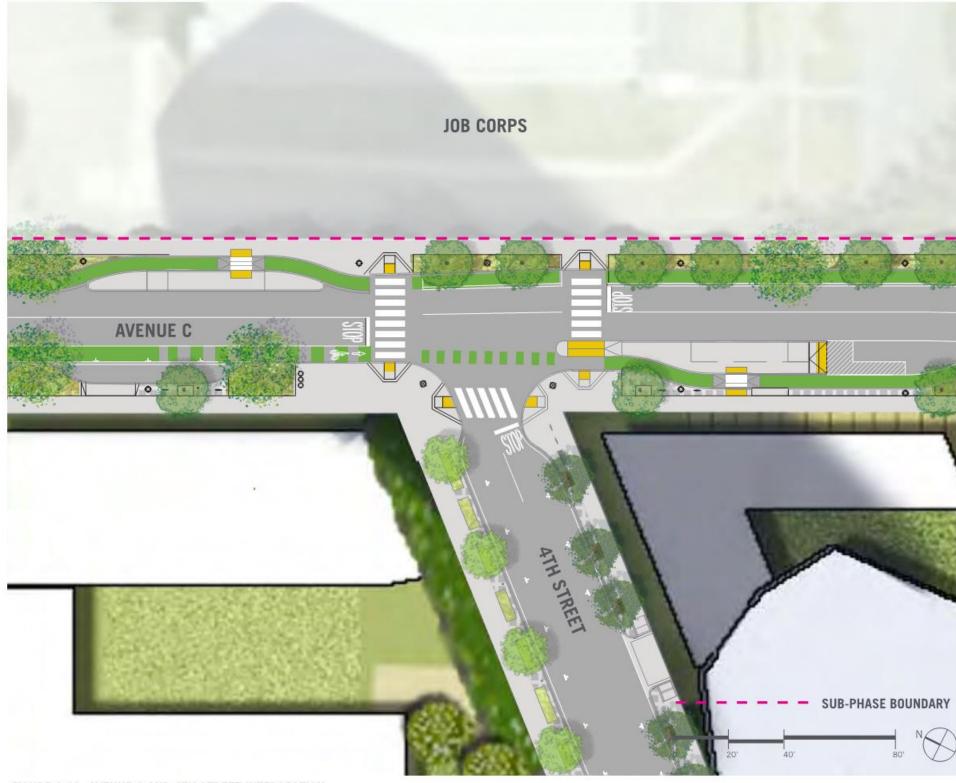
AVENUE C AND 4TH STREET INTERSECTION
